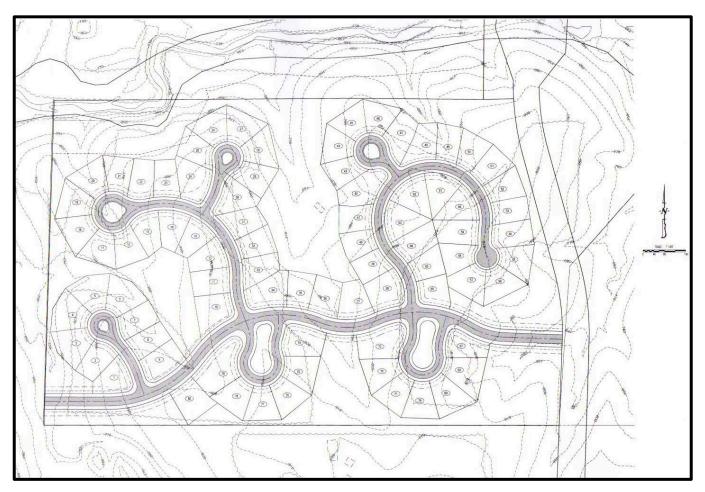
Rolling Hills Tract 5 Development – Preliminary Plan
